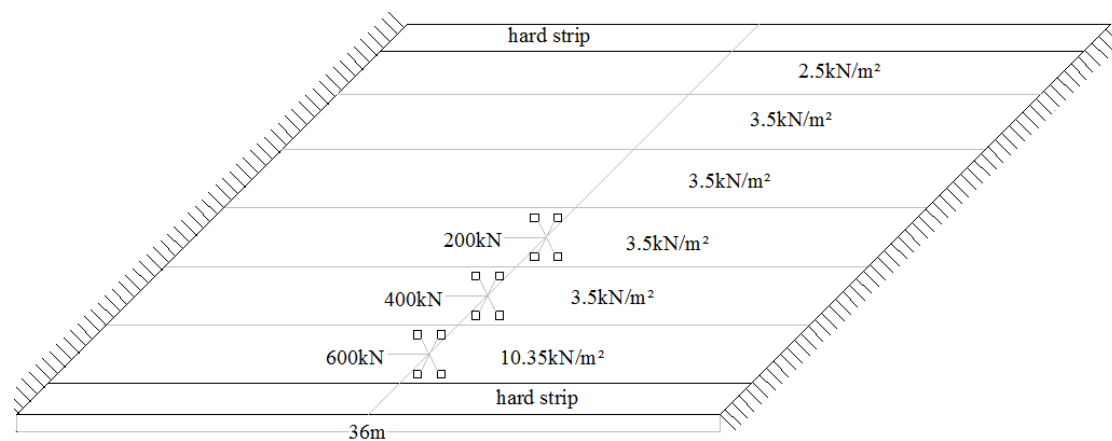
4, Load case 1(Load arrangement for maximum longitudinal bending moment)
